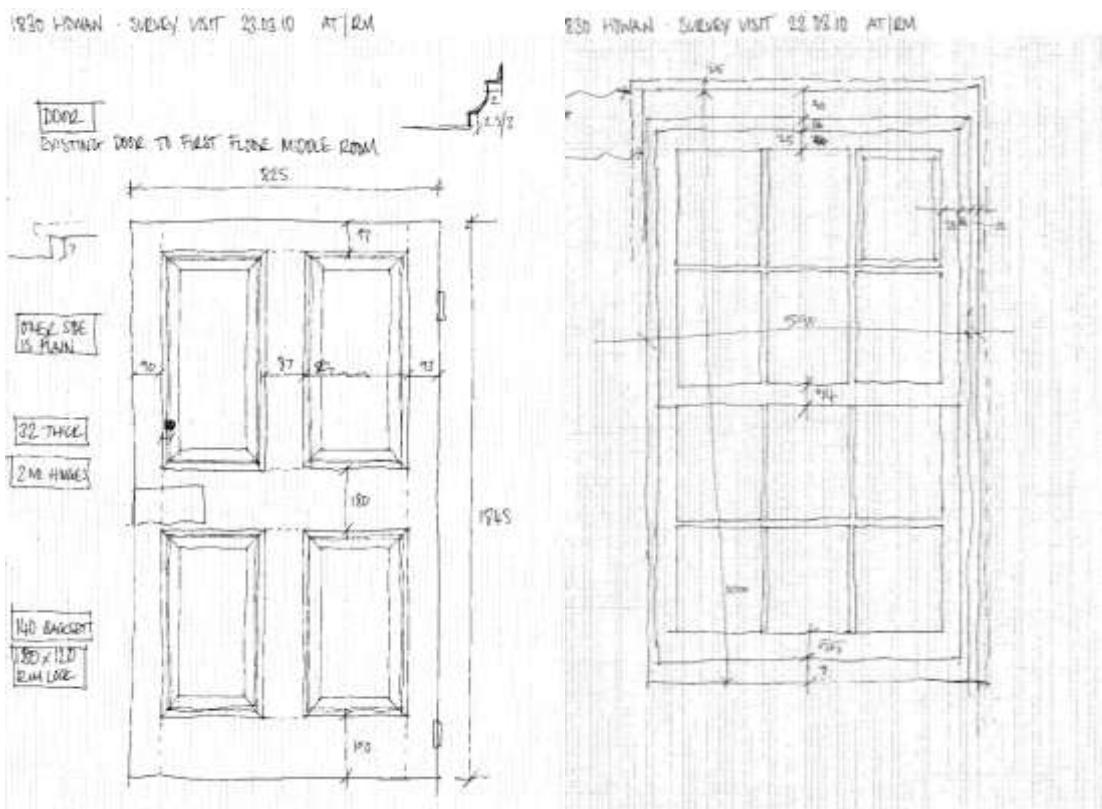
Examples of initial survey drawings, intended to record architectural details prior to works
